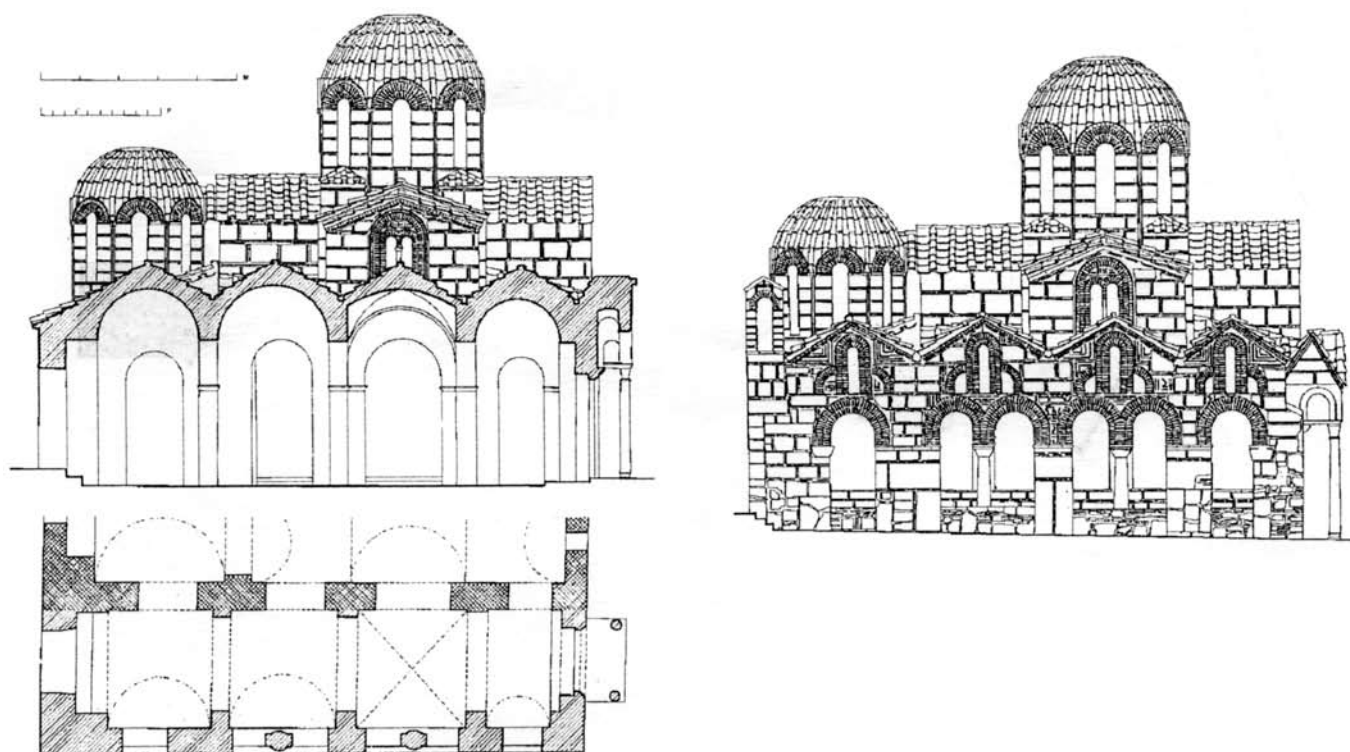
Restoration drawing of the western open portico at Kapnikarea. Plan, longitudinal section and west view
